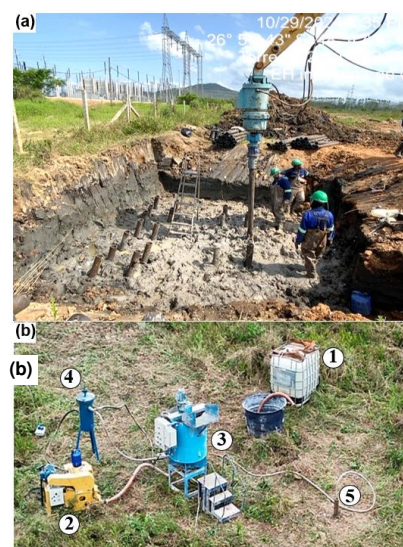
Injected helical pile: a) installation pile group in the field; b) cement grout injection equipment: (1) water reservoir, (2) piston pump, (3) grout mixing tank, (4) pressure stabilizer, (5) injection shutter coupled to the pile.
